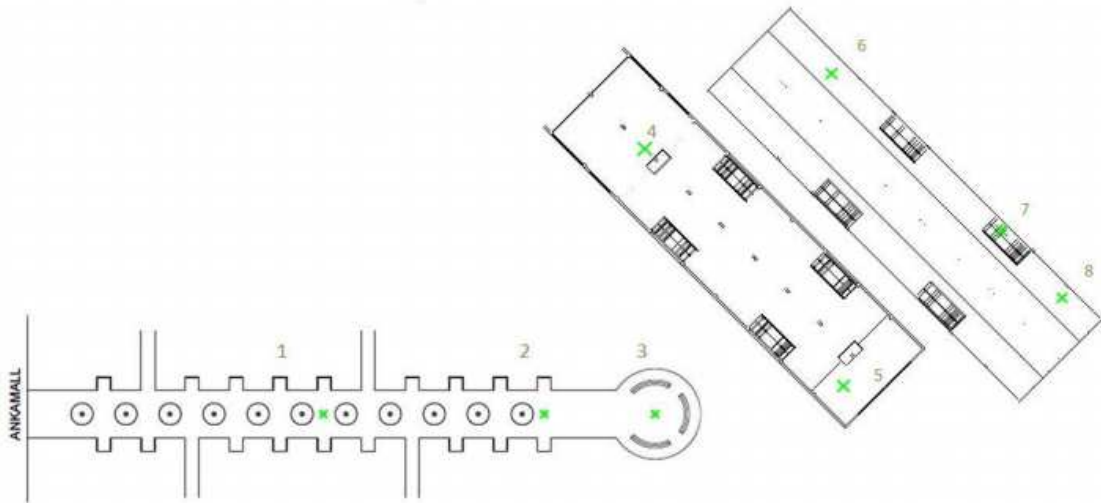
The eight spots on the plans used for objective and subjective measurements (1-3: ANKAmall Park; 4-5: metro station entrance; 6-8: metro station underground platform)
